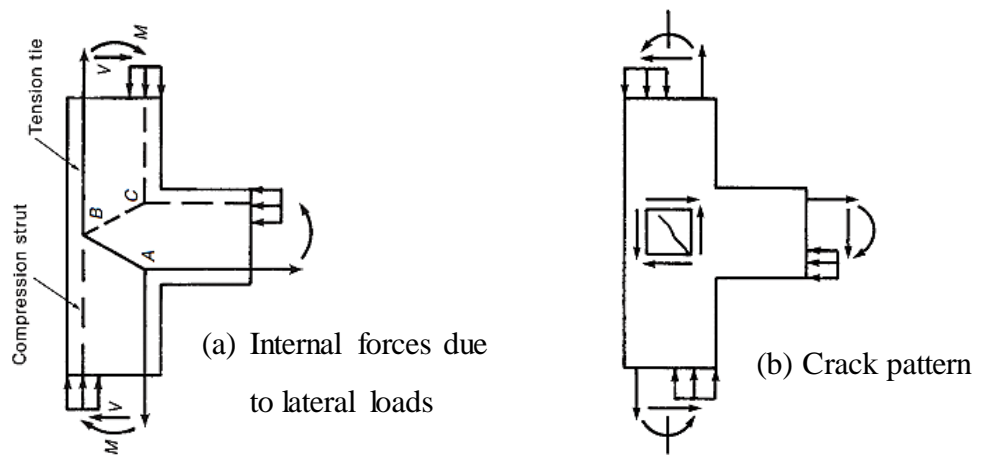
Exterior Beam-Column joint internal forces and Crack pattern [20]
